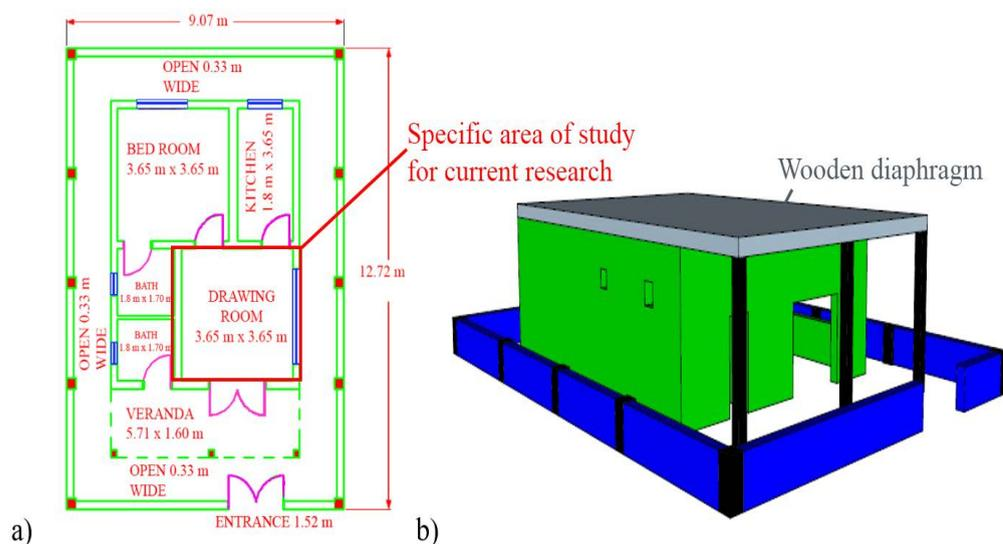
Proposed interlocking plastic block house [13], a) plan b) 3D structure.
